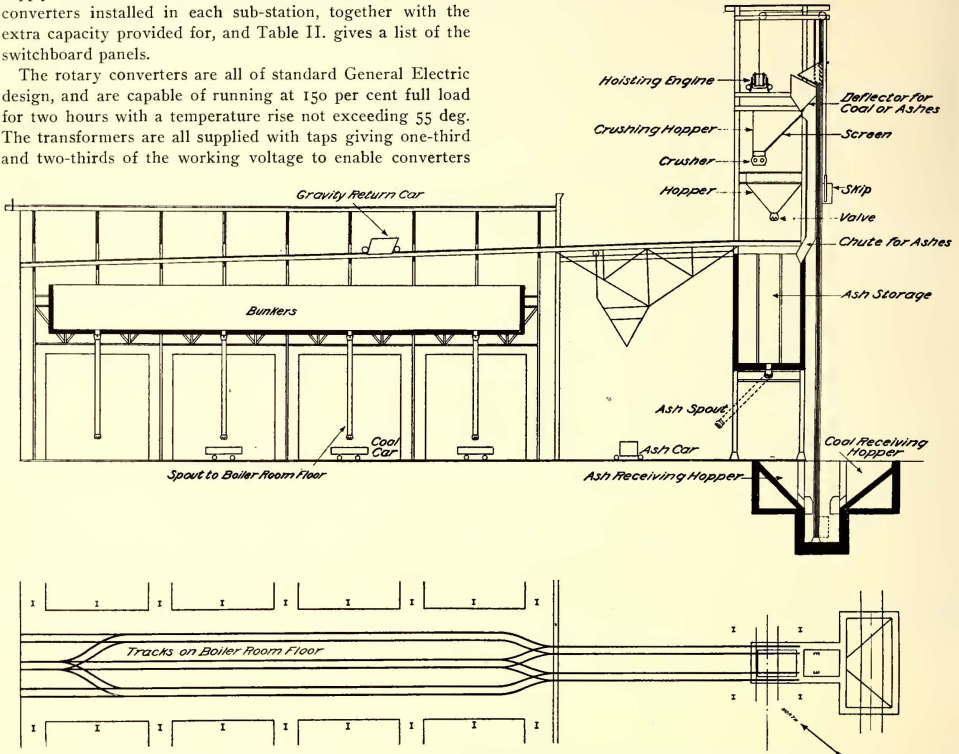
PLAN AND ELEVATION OF COAL AND ASH HANDLING MACHINERY AT WESTVILLE POWER STATION
